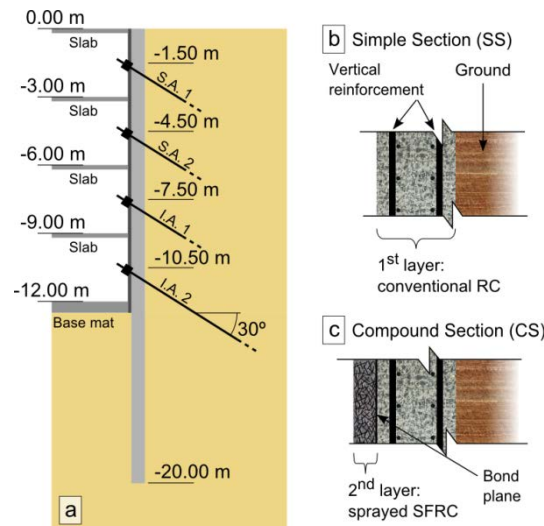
(a) Model geometry: Anchorages and slabs positions; (b) Simple Section; (c) Compound Section
